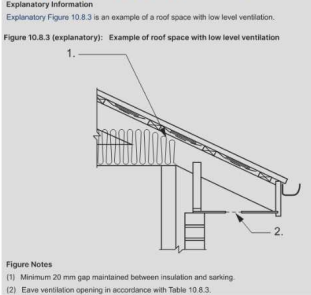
(explanatory): Example of roof space with low level ventilation
